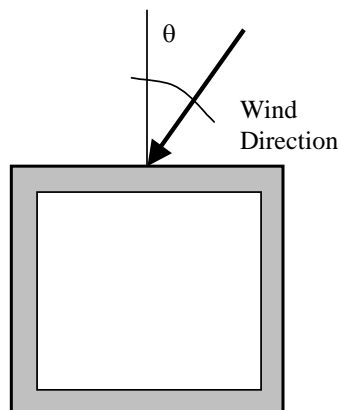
Plan view of building with definition of wind angle to exposed wall.
